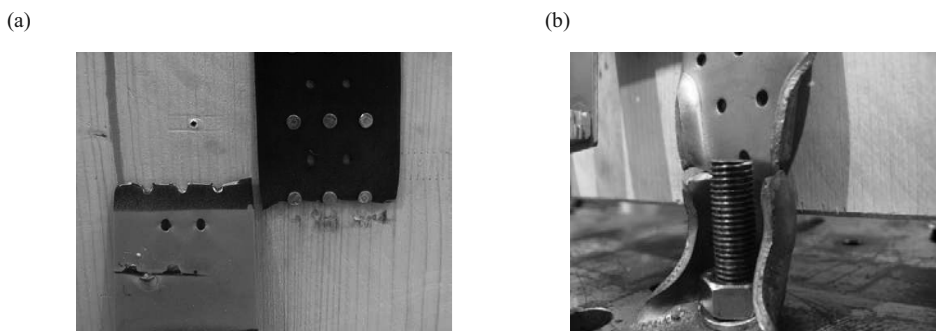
(a) Mechanism of inelastic deformation of a light framed wall with shear deformation; (b) mechanism of inelastic deformation of a CLT wall following the collapse in the ground anchoring devices (Loss et al. 2013a).
